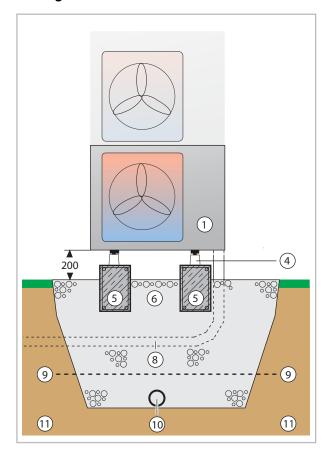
Condensate drainage, seepage of condensate and strip foundation (cross-section)
